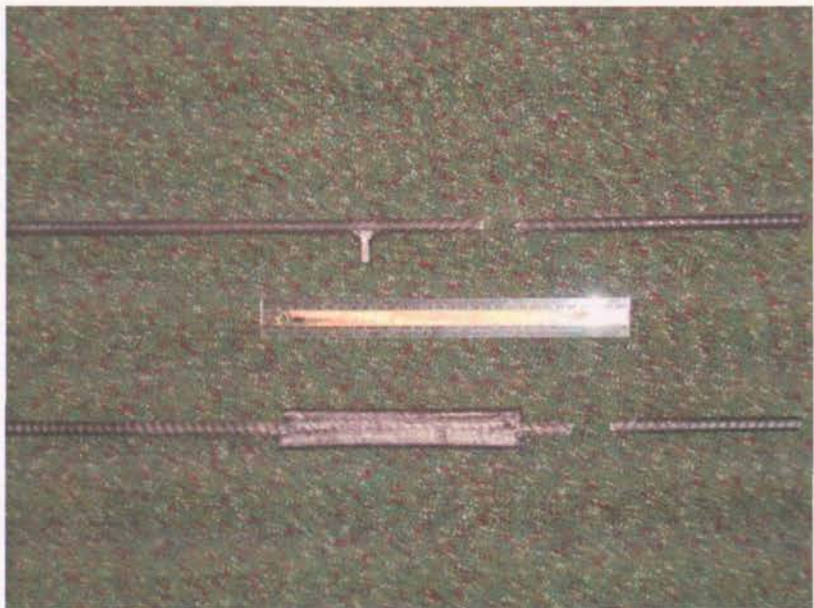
Fractured steel sample of 12mm bar with stud and round bar welded to it
